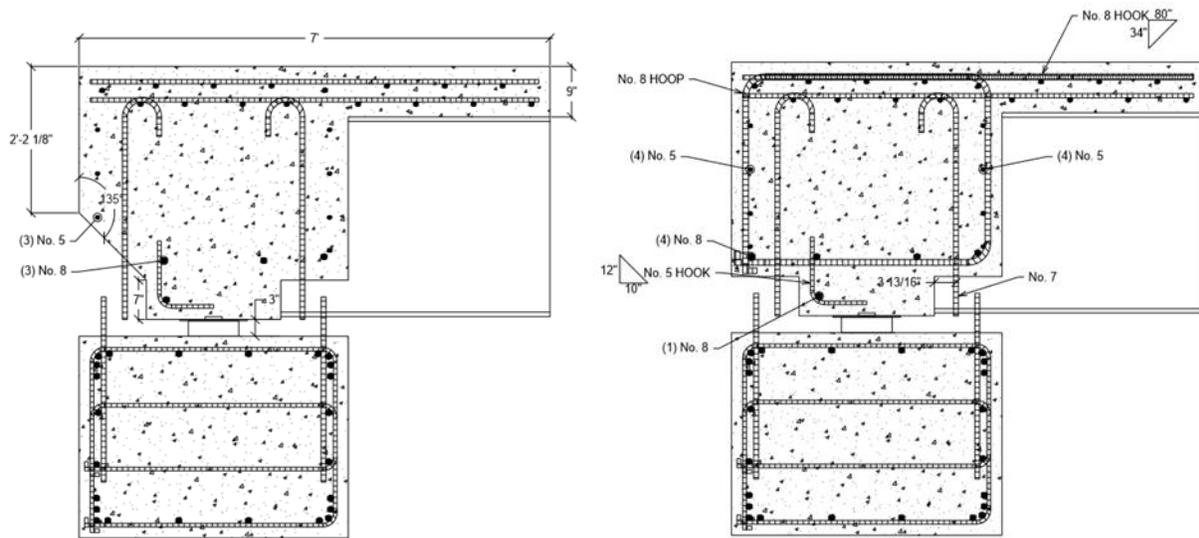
Plan view of UHPC-Joint specimen showing locations of connection bars.
